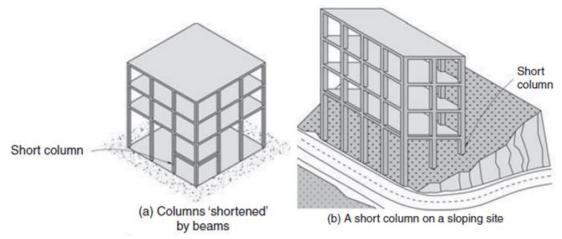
Examples of Short Columns Among Longer Columns (Charleson, 2008)
